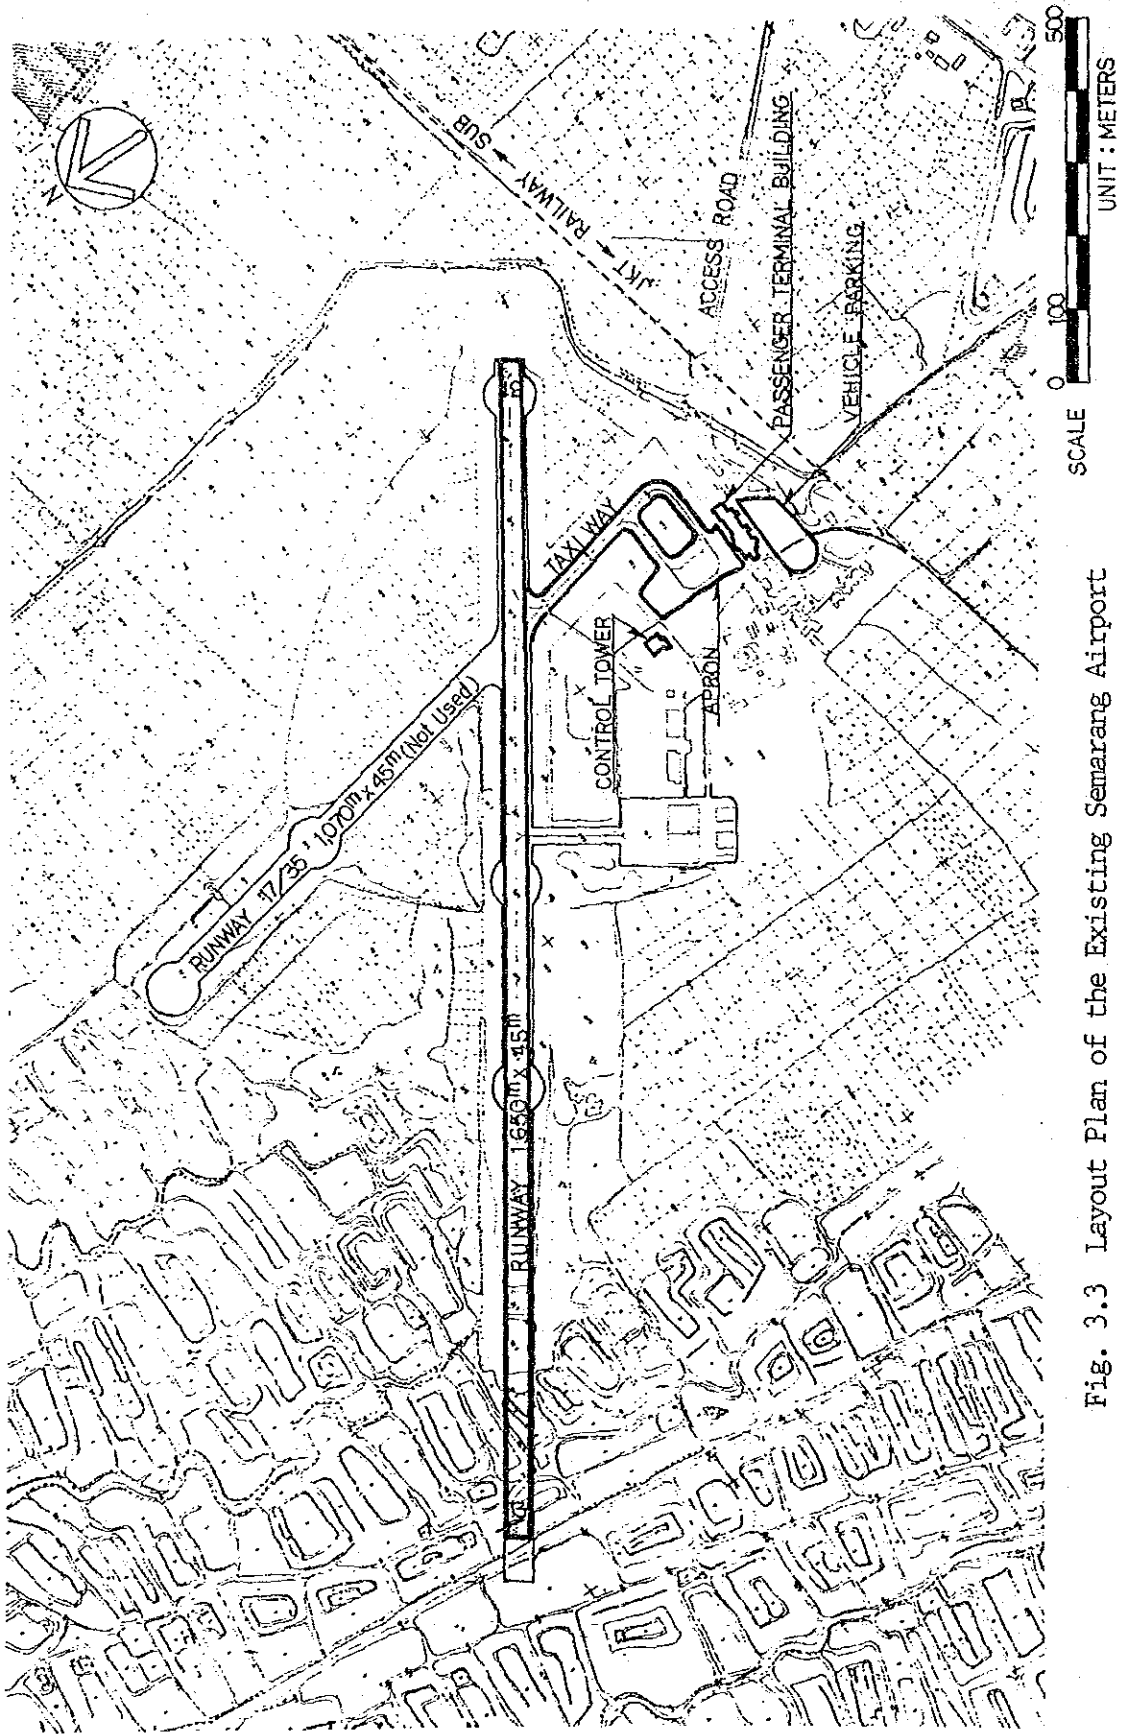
Layout Plan of the Existing Semarang Airport
